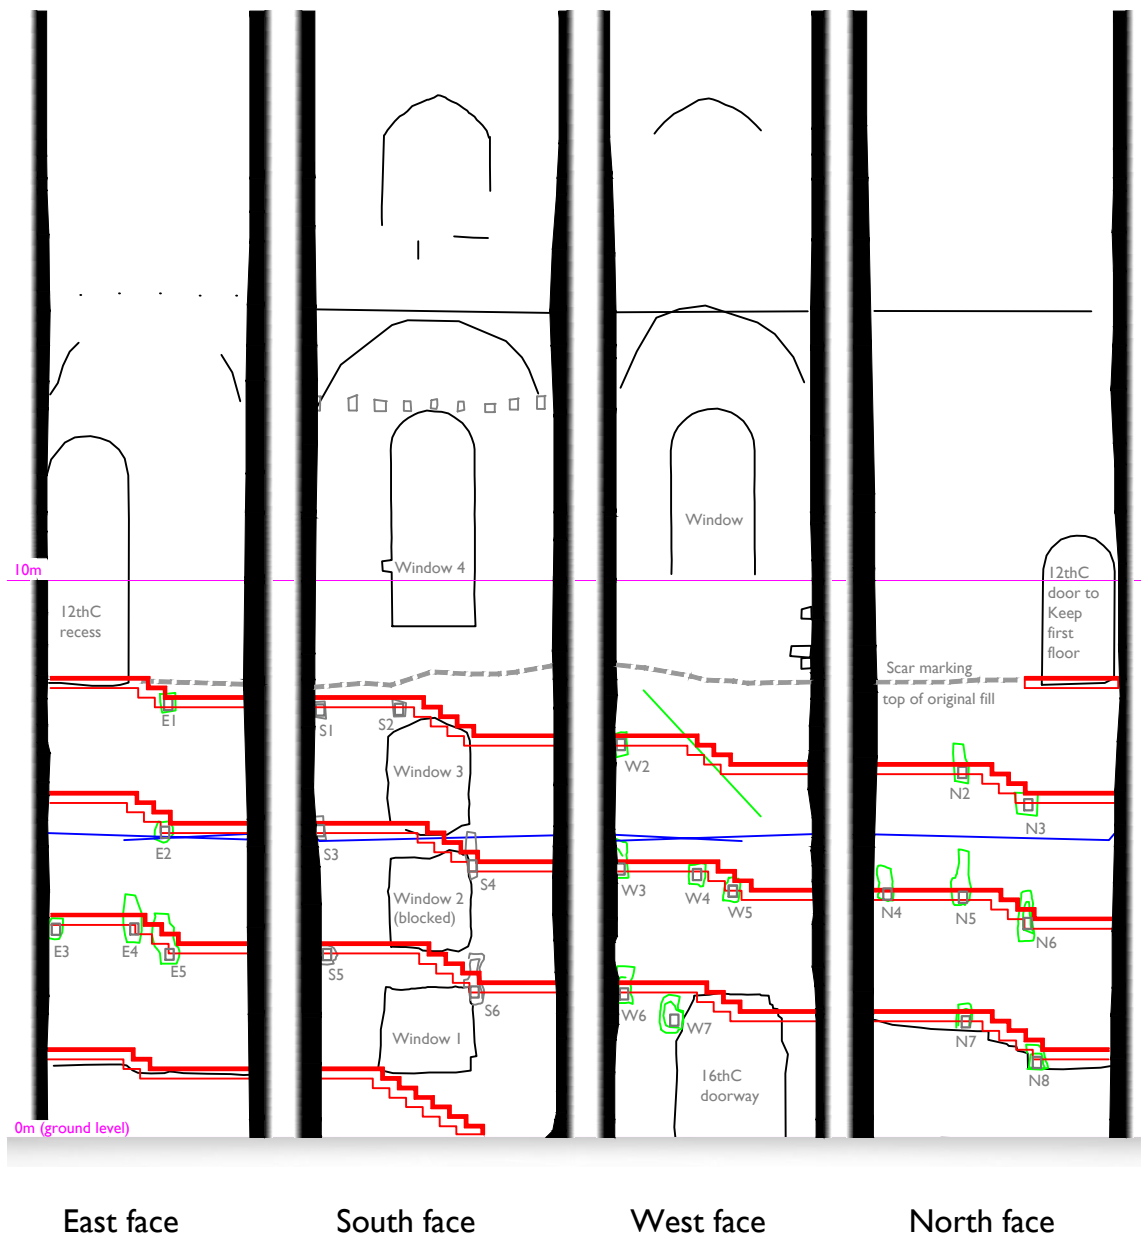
Kenilworth Castle keep, SW corner stair tower surveyed elevations and stair reconstruction with half top landing
